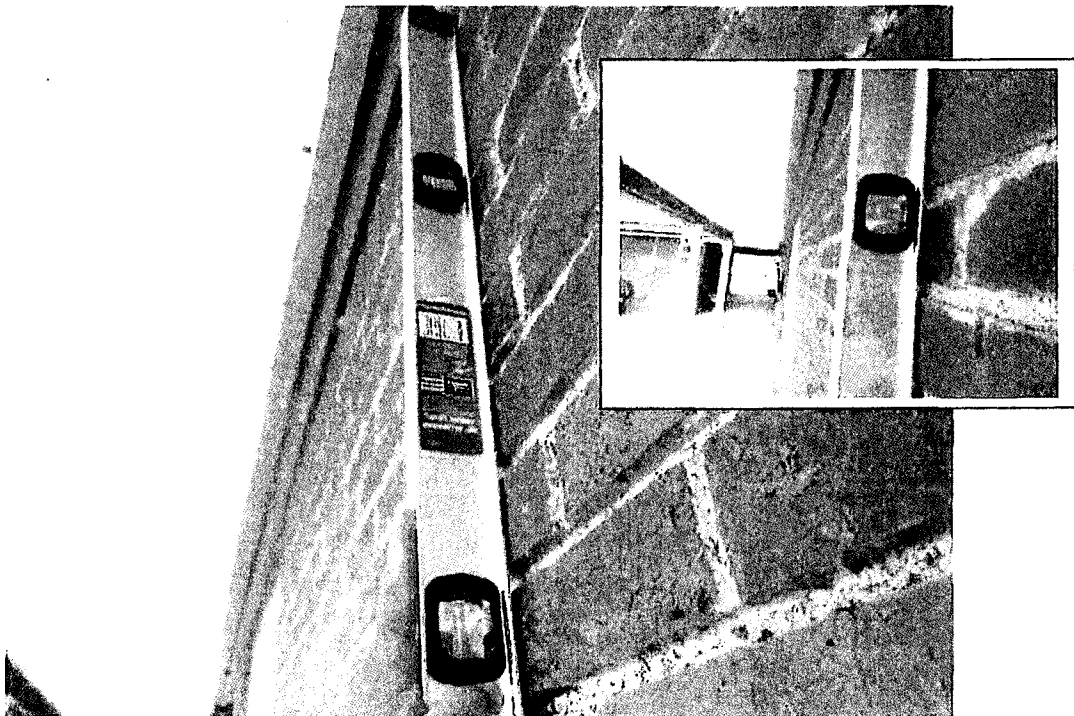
View of the approximately plumb measurement of the exterior wall.
